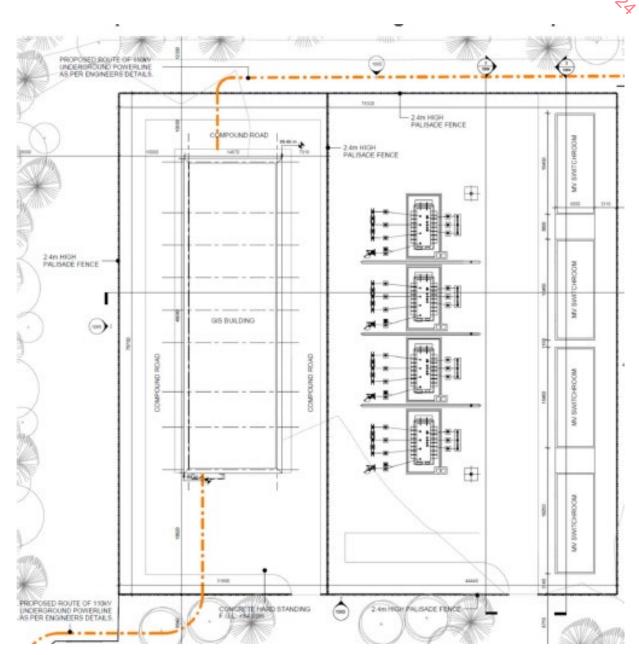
D. 10: Proposed Substation Arrangement (Indicative)
